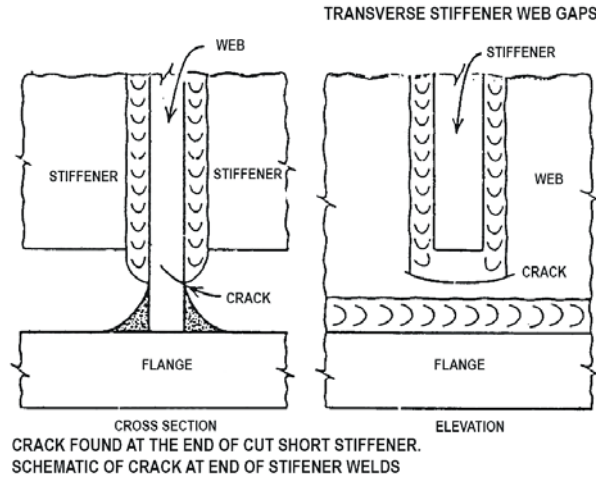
Fracture of members at end of weld, through hole.
